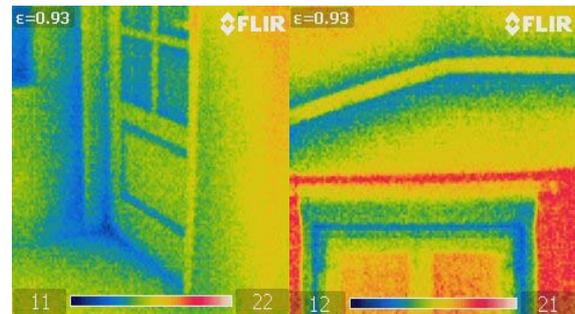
Door, Ceiling and Window Thermal Leaks.
